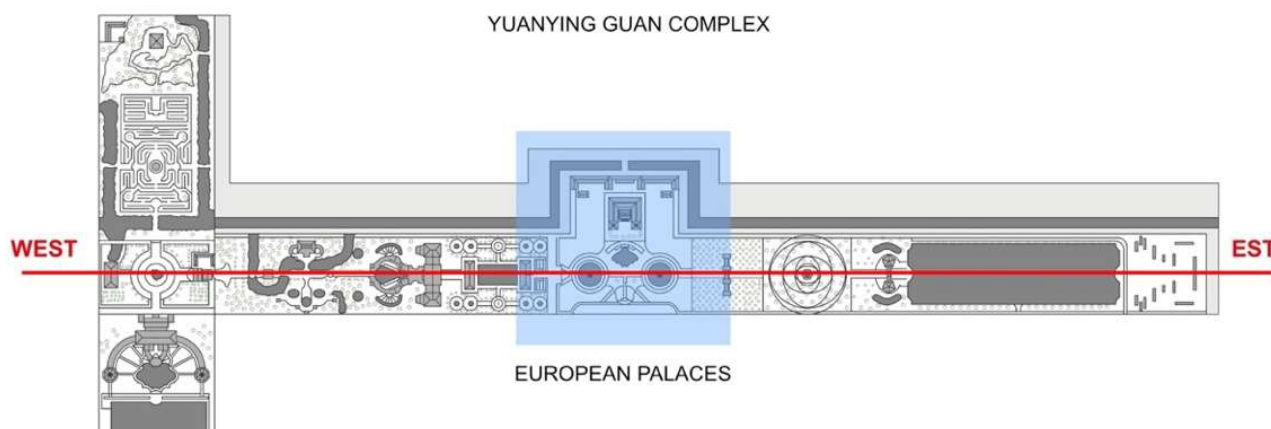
Plan of the European Palaces. This reconstruction has been made from the general plan (restitution plan 1985 of Antoine Durand). Source: author’s reconstruction.
